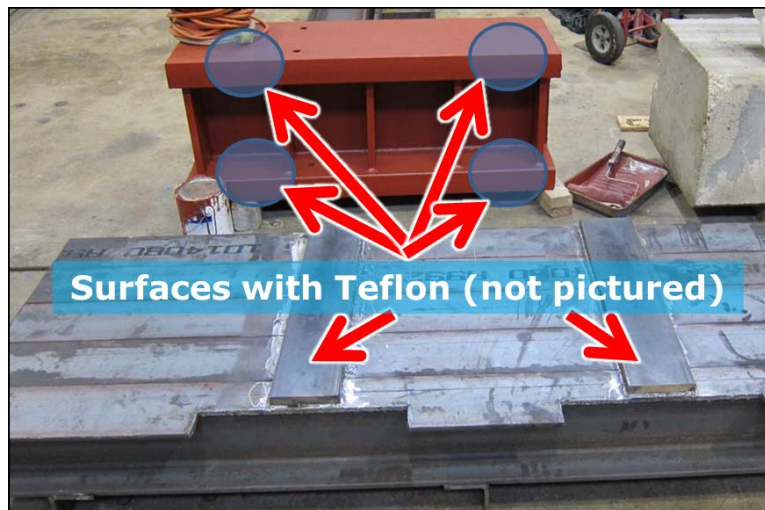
Teflon Mounting of Track Beam and Loading Beam
